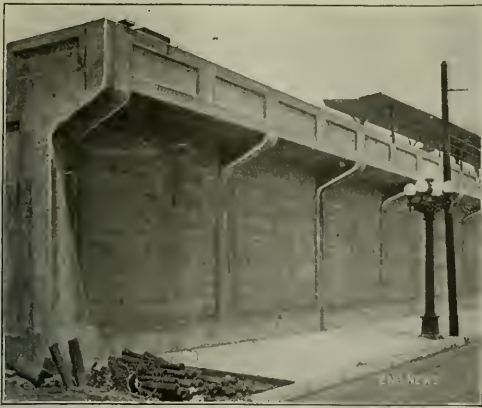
REINFORCED-CONCRETE RETAINING WALL
